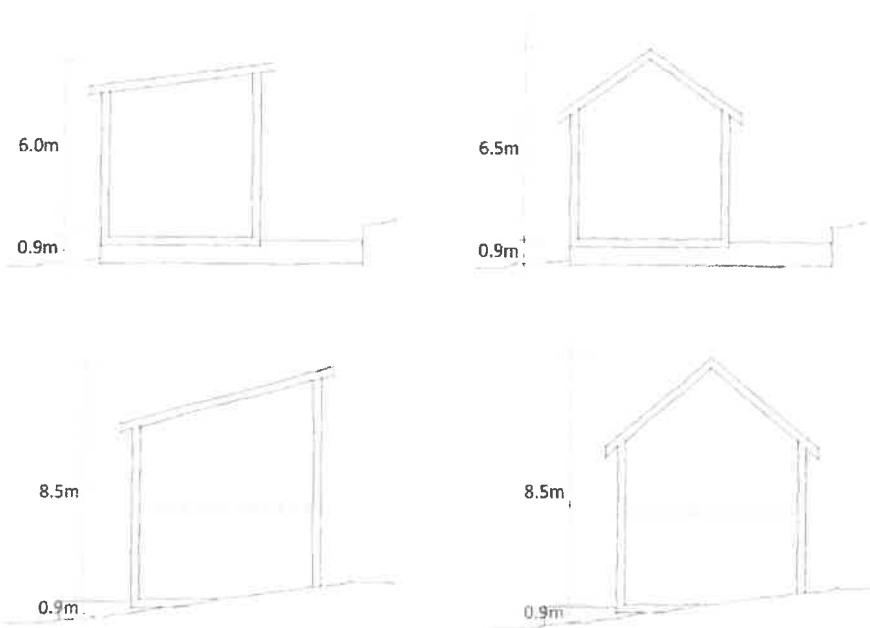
West Precinct Maximum Permissible Building Height
